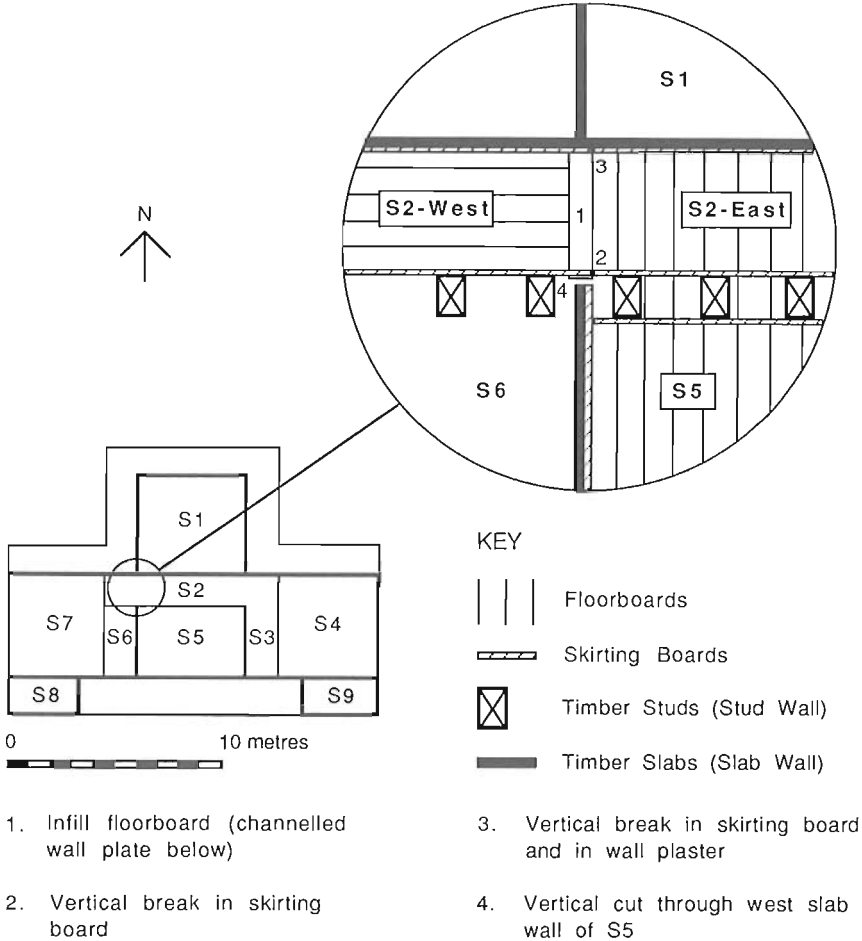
Dundullimal. Ground plan showing the space numbers and structural elements referred to in the text.
